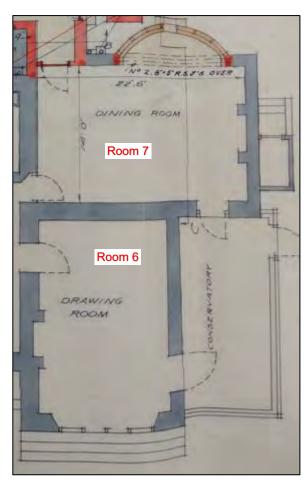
Extract from the 1929 plan showing Rooms 6, 7 and 8 (BARS ref: RDB P 1/1314)
